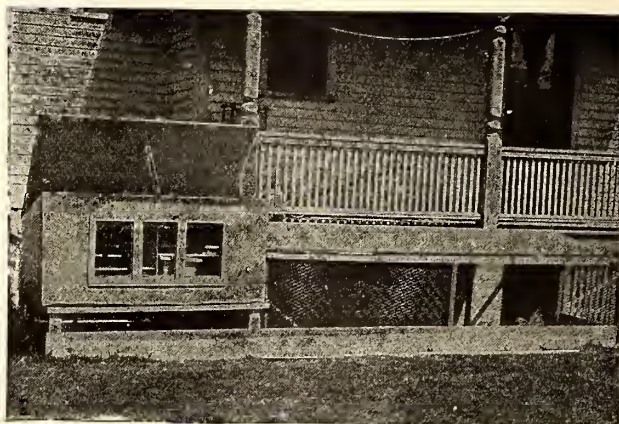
A house of similar arrangement, showing hinged roof, which makes the whole interior easily accessible.
